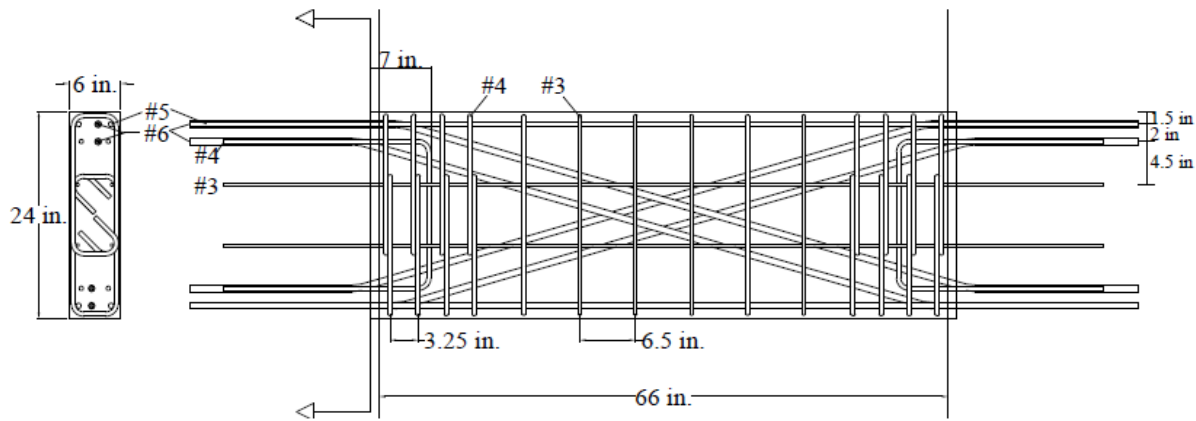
Reinforcement detailing for CB-3 (adapted from Setkit, 2012)
